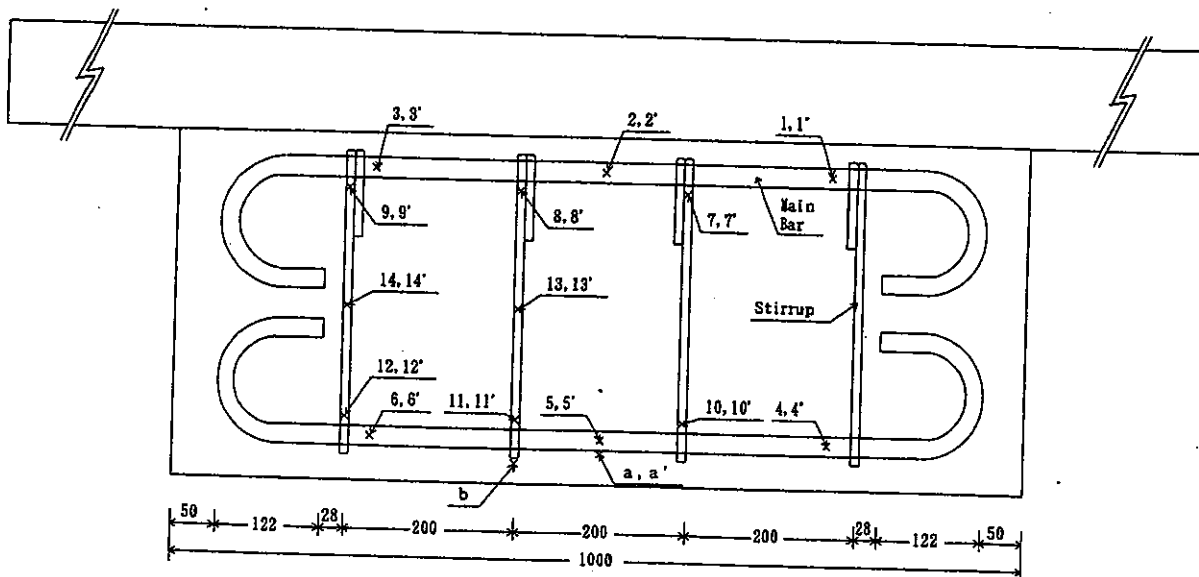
Common Side View of GRC Specimens and Concrete Specimen
